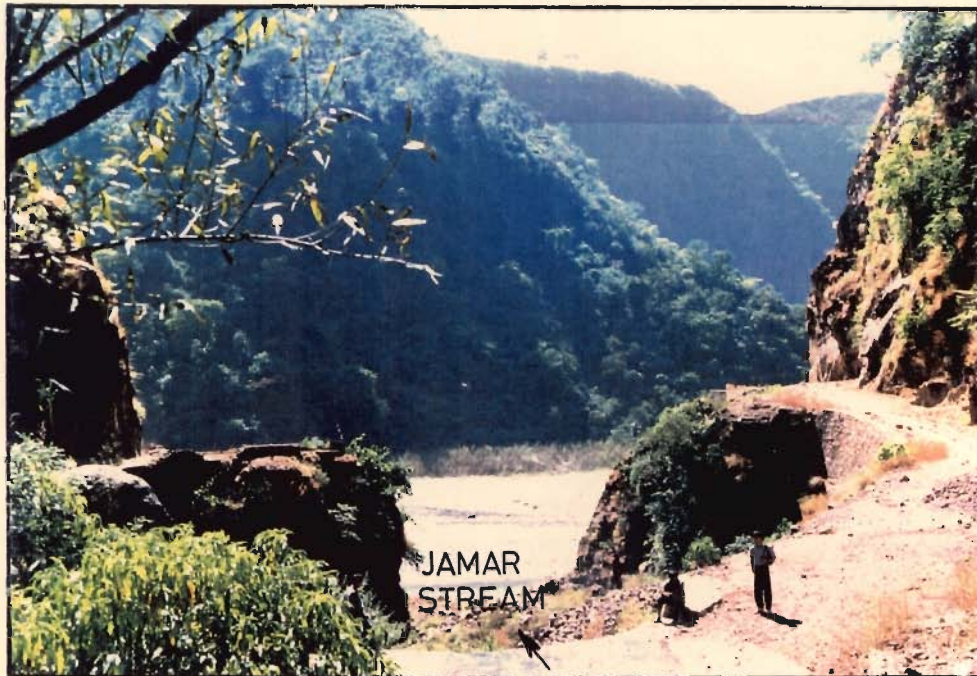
A VIEW OF POWER HOUSE SITE
